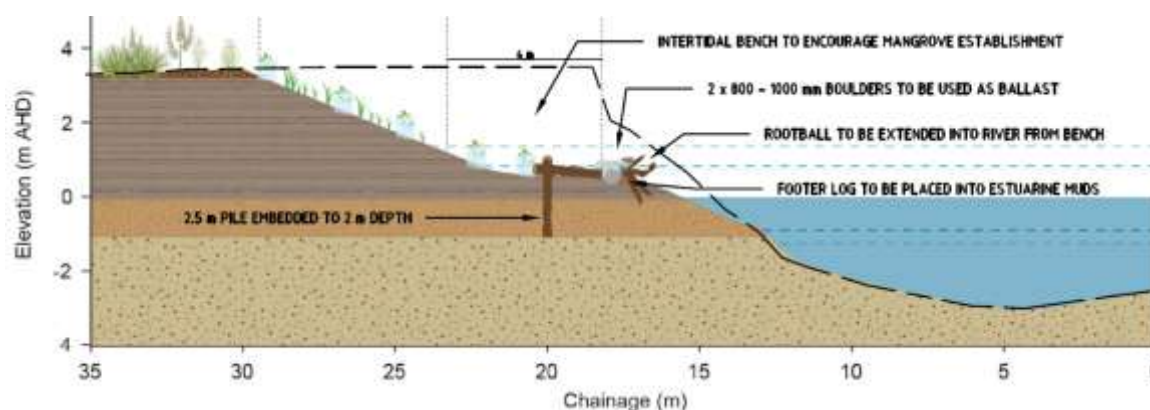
Design cross section showing bank profile and log placement in relation to tidal planes
